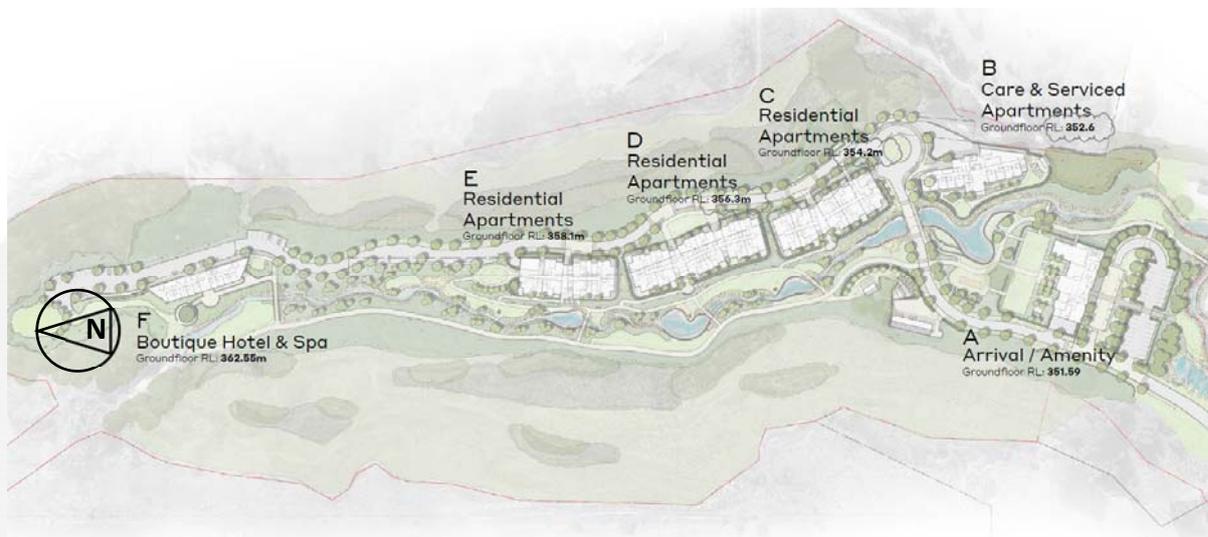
Retirement Village Layout (Extract from Woods Bagot Drawing)
